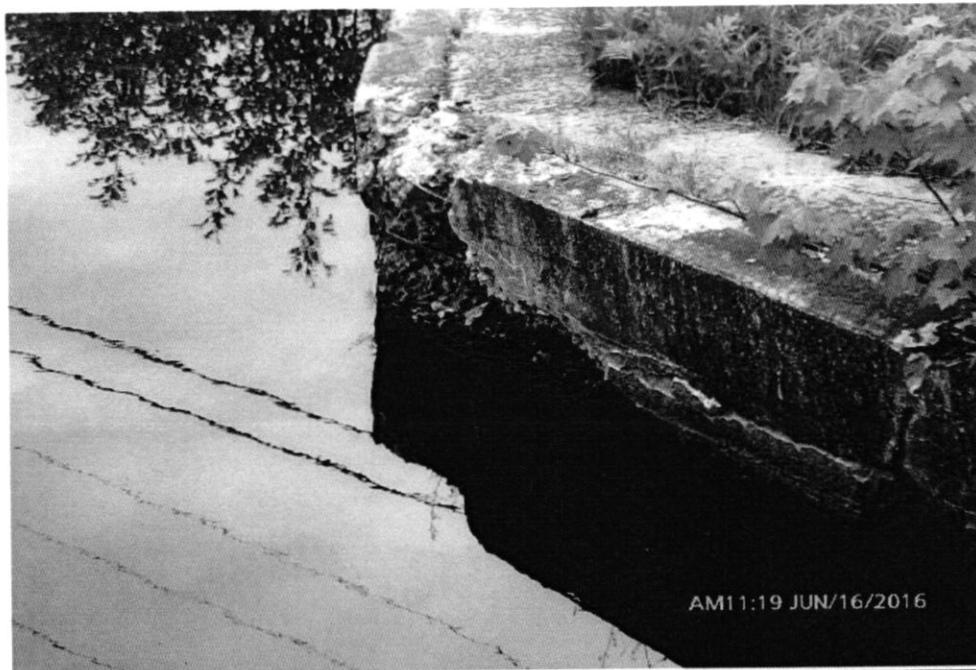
Dam ID# 162-1283 Paramount Pond Dam 06/16/2016
